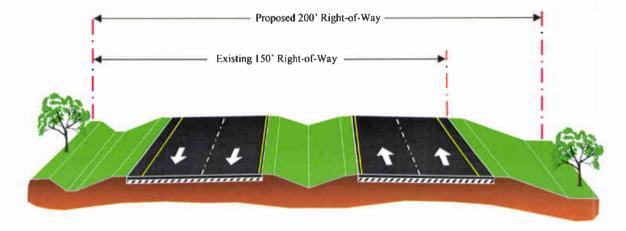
Proposed East Alignment Typical Section (Alternative 2)
